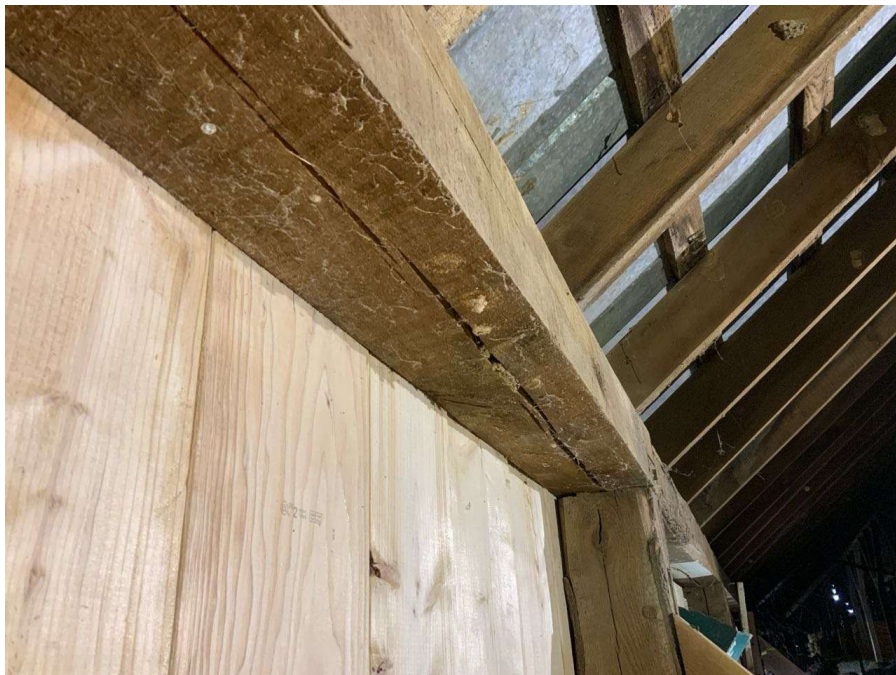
Typical check on bottom face of perimeter roof beam. Roof beam between Column B/1 and Column C/1 shown.
